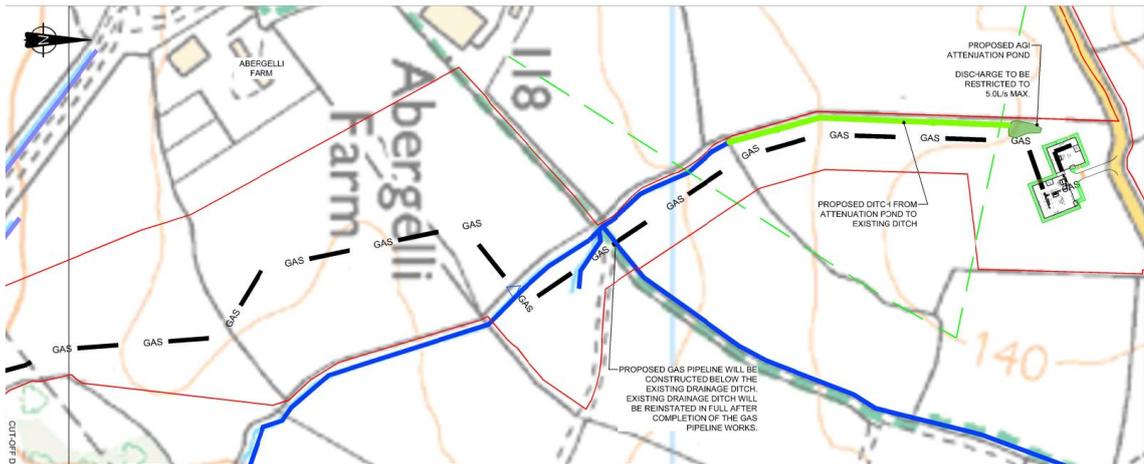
Plan showing nearby drains and watercourse to the site (North section)
